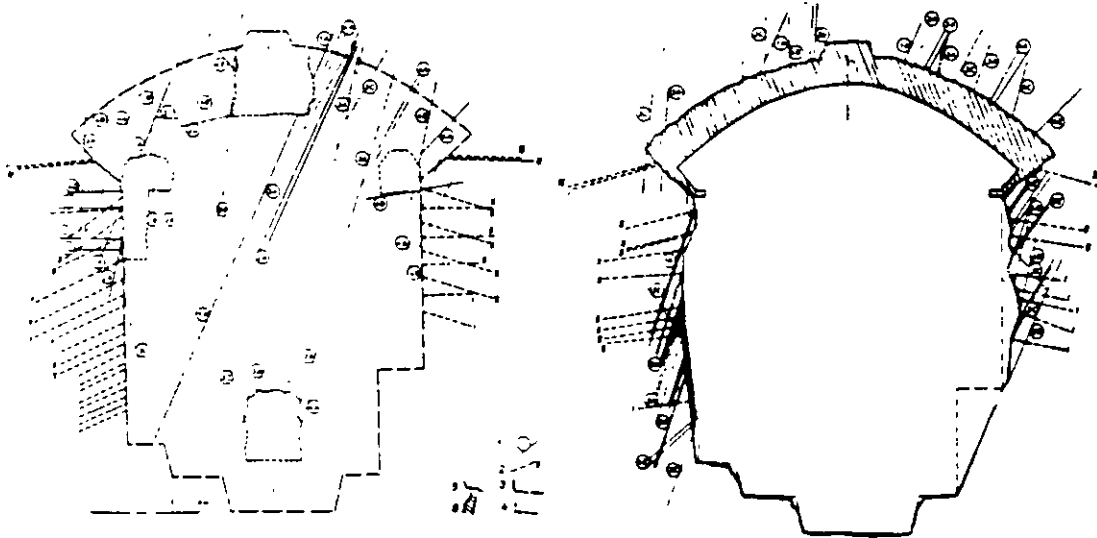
Typical cross-section of the main cavern. A - distribution of the anchored steel bolts proposed on the basis of the structural conditions of granite found in pilot drifts B - structural conditions found during the full-scale excavation and bolts already fixed. 1 - lines of intersection of joint planes with the section plane, type of joint is designed, 2 - bolts with lengths marked, 3 - schematic line of the full excavation, 4 - outline of the excavation for pilot drifts, 5 - actual outlines of the full-scale excavation, 6 - concrete protecting vault and concrete seal in the rock face.
